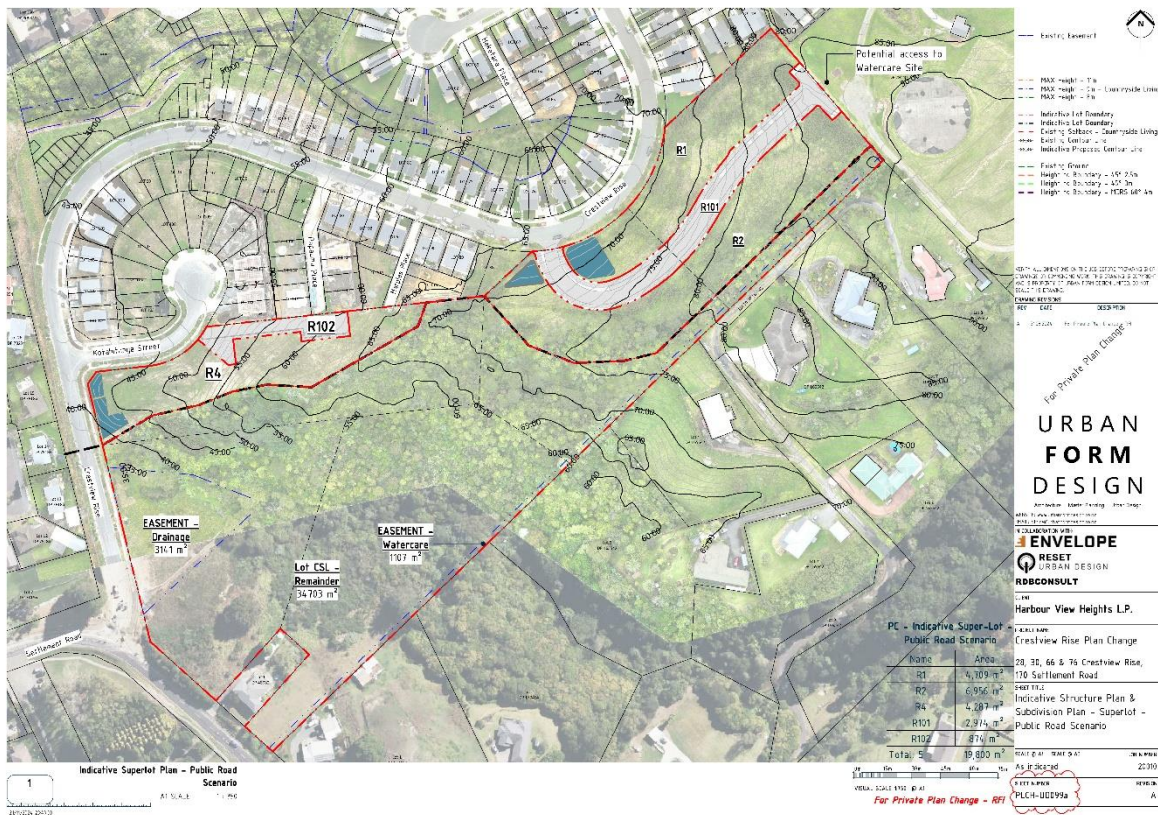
Indicative Structure Plan & 'super-lot' plan, refer to the urban design drawings, Sheet UD099a for the correct scale
